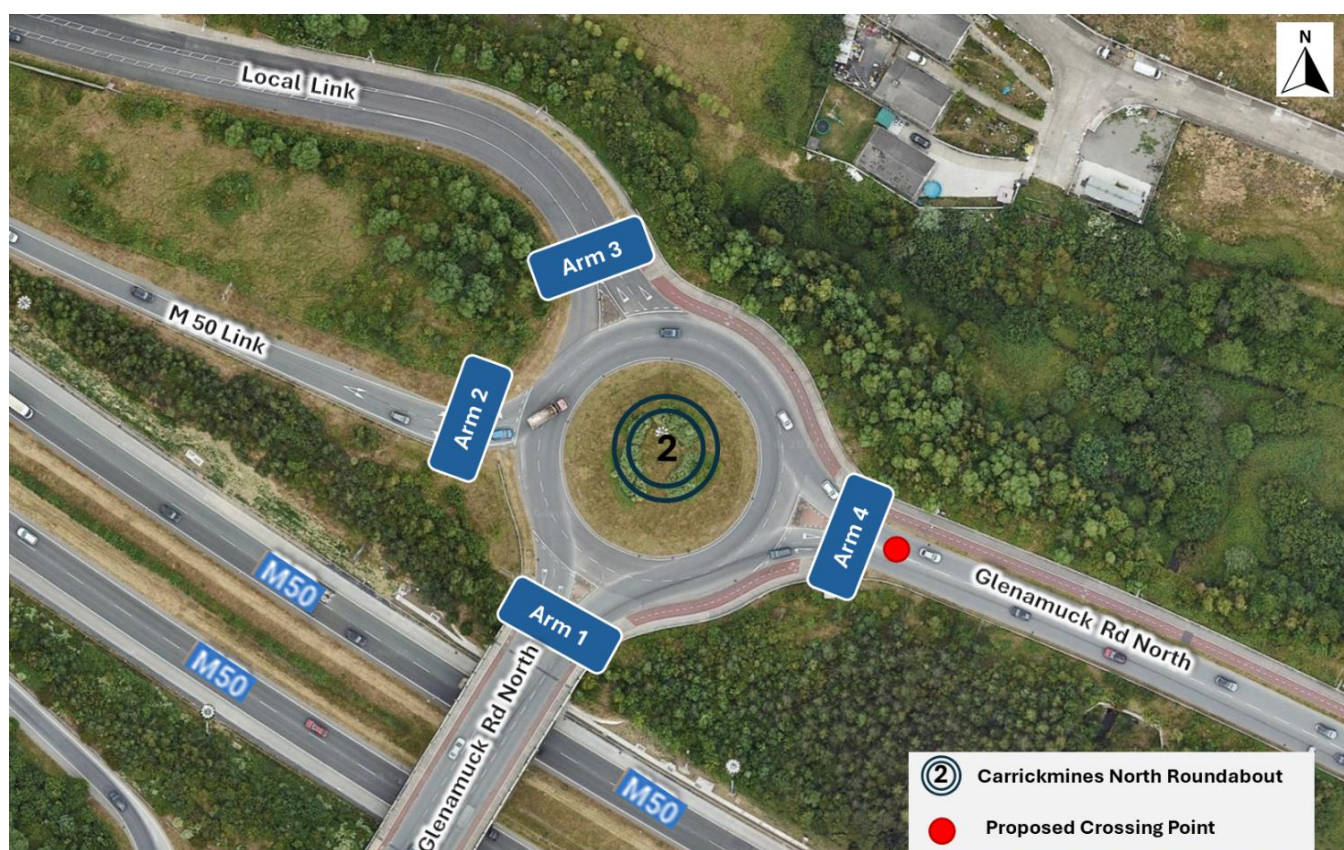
Existing and Proposed Layout of the Carrickmines North Roundabout
